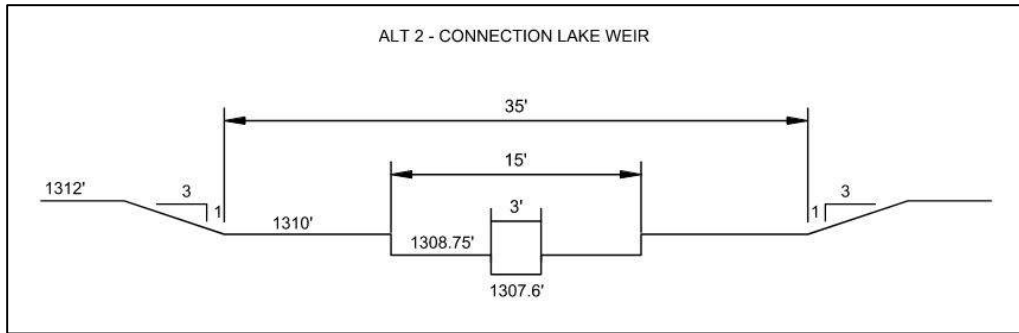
Alternative 2 Connection Lake Outlet Structure Layout
